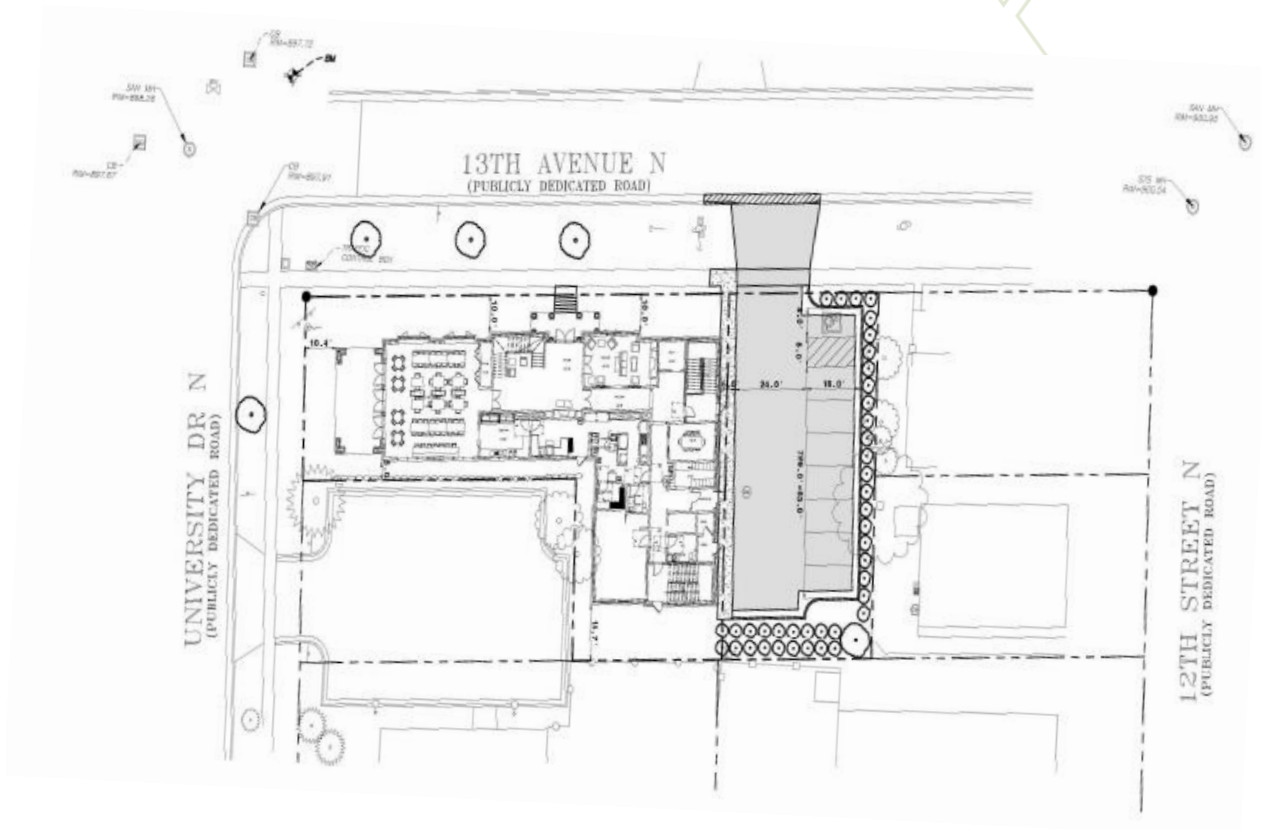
Exhibit A. Site plan for 1210 and 1206 13th Ave. N to include onsite parking.
